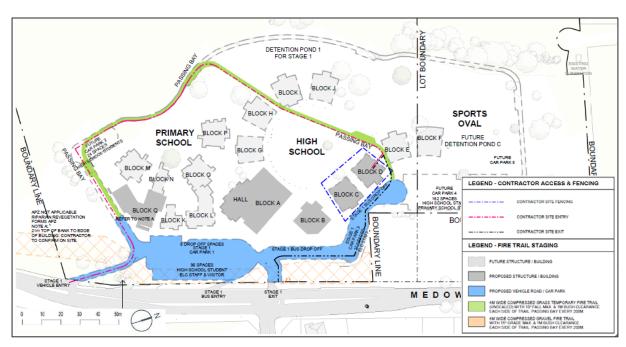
| Site Construction Arrangement – Stages 2a and 2b (source: SRtS 2019)
